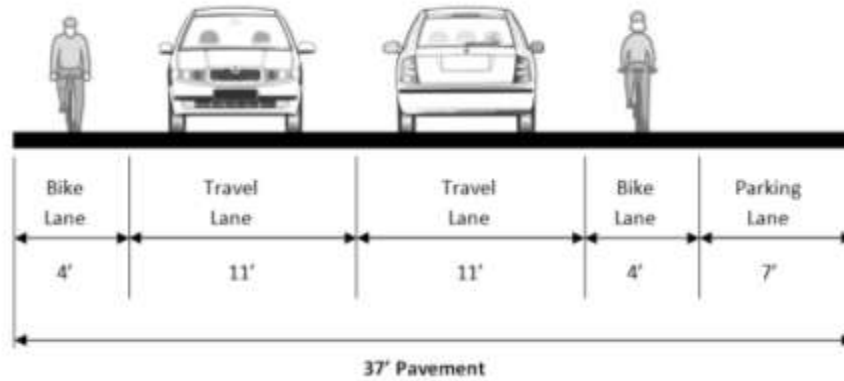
Baldwin Street and Memorial Avenue Pavement Widths (in feet)
